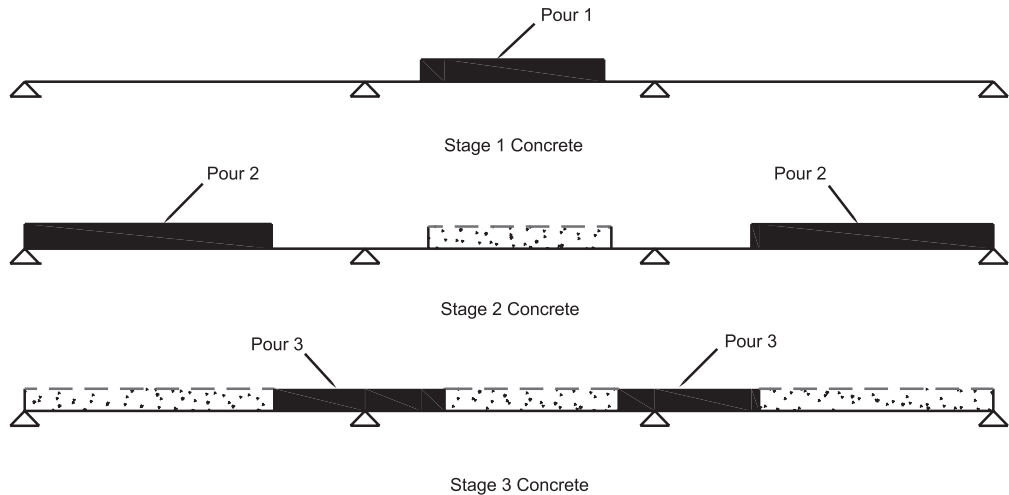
Stage concrete deck construction for long spans (density of wet concrete = 160 pcf).
